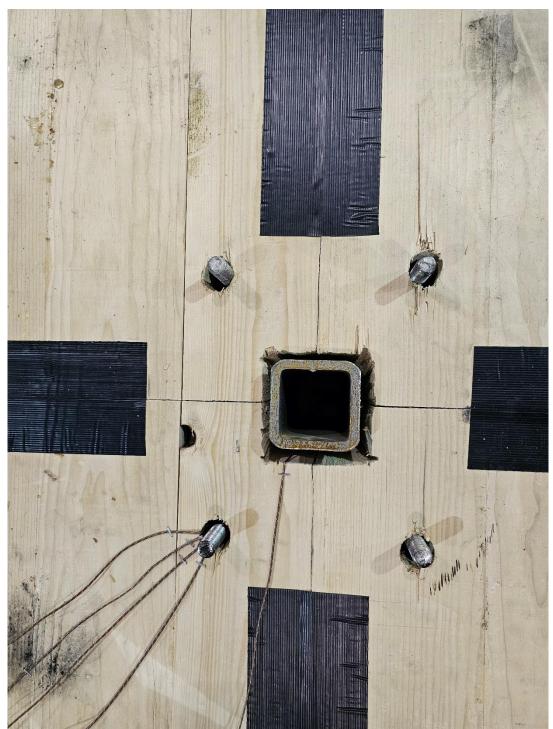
CLT panel joints and steel column connection prior to steel plate installation.
